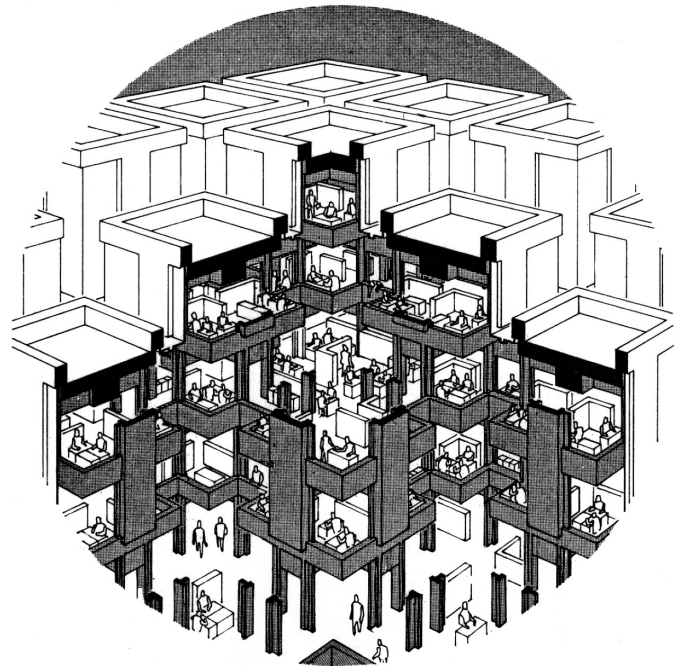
Section-perspective of building and space fabric (Hertzberger, n.d.-b, p. 327)
